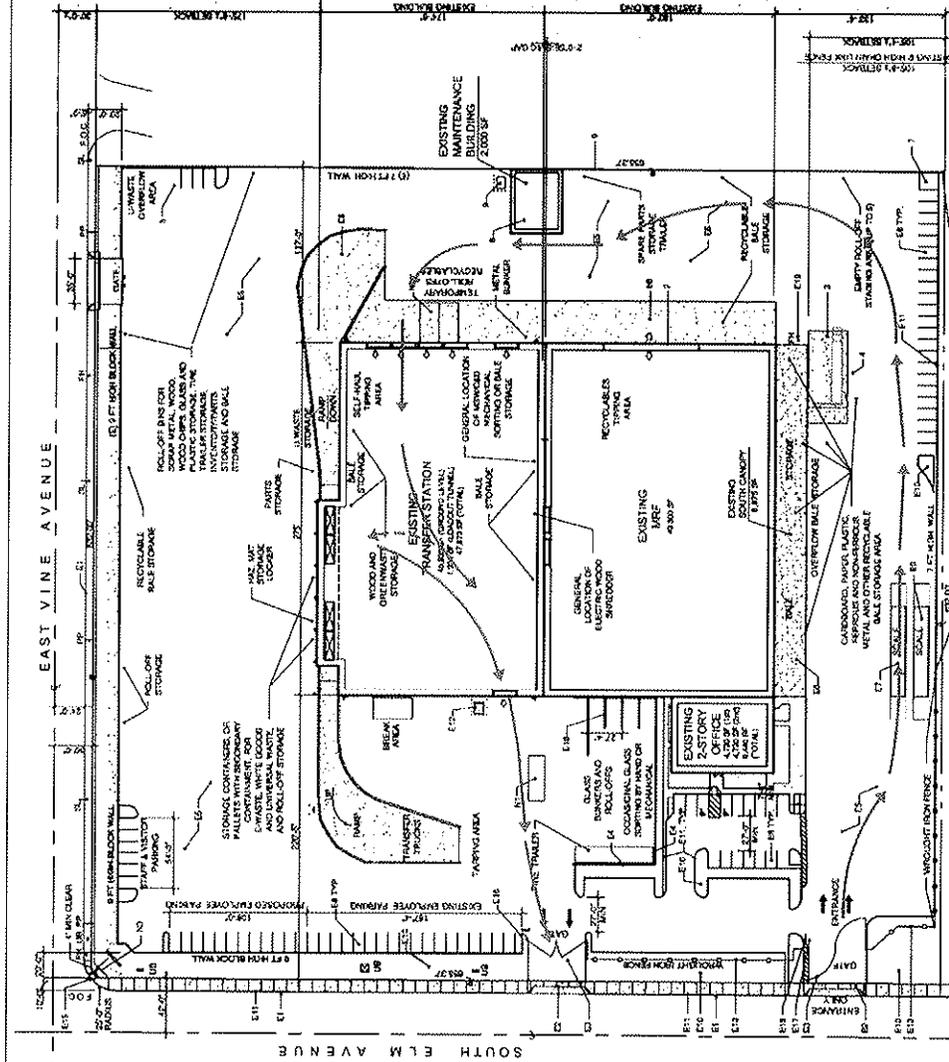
B: COLLECTION TRUCKS ON-SITE CIRCULATION PLAN
